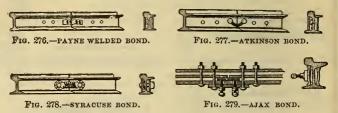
shows the Atkinson bond, which is expanded into contact with the rail hole by pressure.
